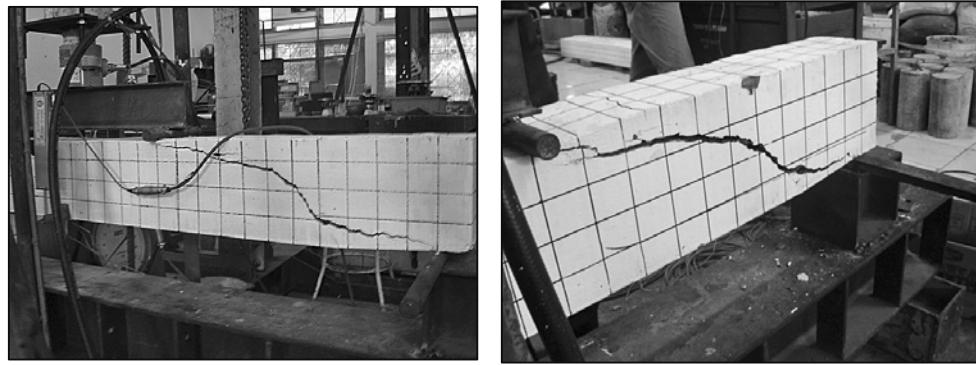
and 6. Normal and slag-concrete beam in shear failure
